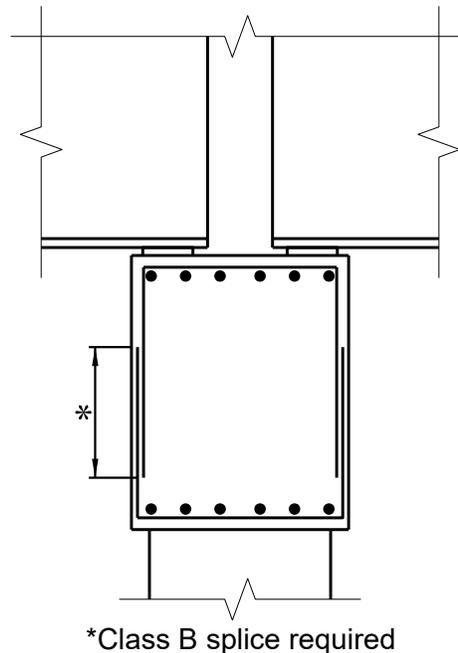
Pier Caps in Post-Tensioned Bridges with a Skew Angle Greater Than 20 Degrees and Deck Reinforcing Not Parallel to Cap
